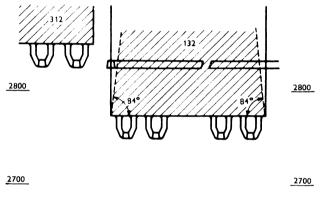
Cross-section showing a drift driven through a caved block. The boundary planes of the caved zone were found to be inclined inward.⁽¹¹⁾
